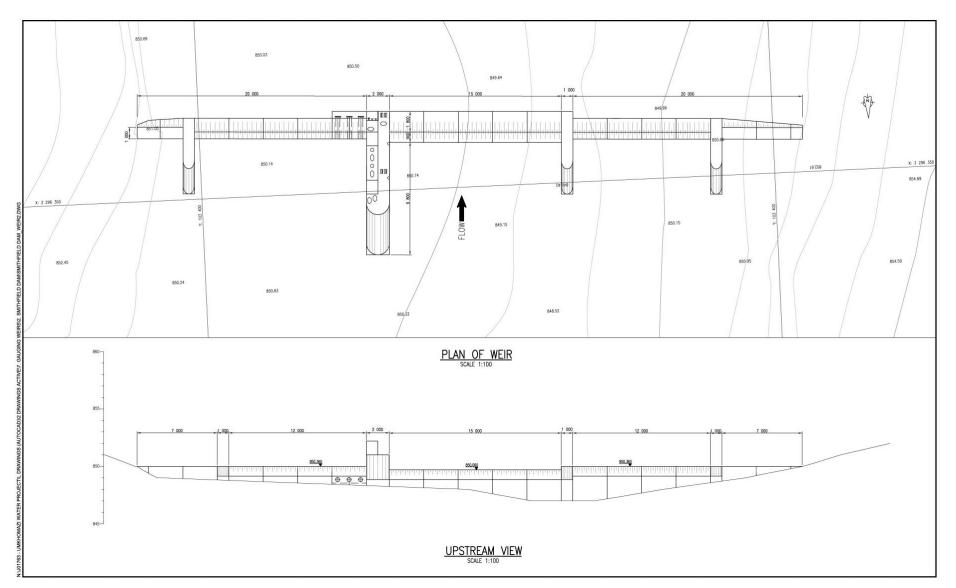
Plan and cross-sectional view of gauging weir downstream of Smithfield Dam
